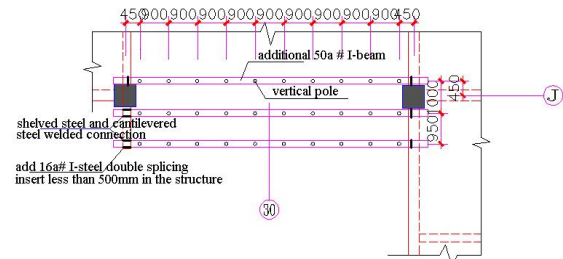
Lay Down Profile Steel Main Beam Plan at +26.650m
